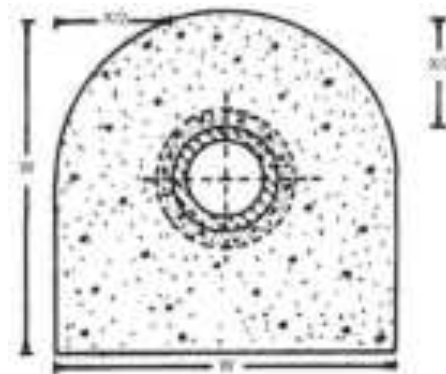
Bedding/ Encasing Stoneware Pipes
